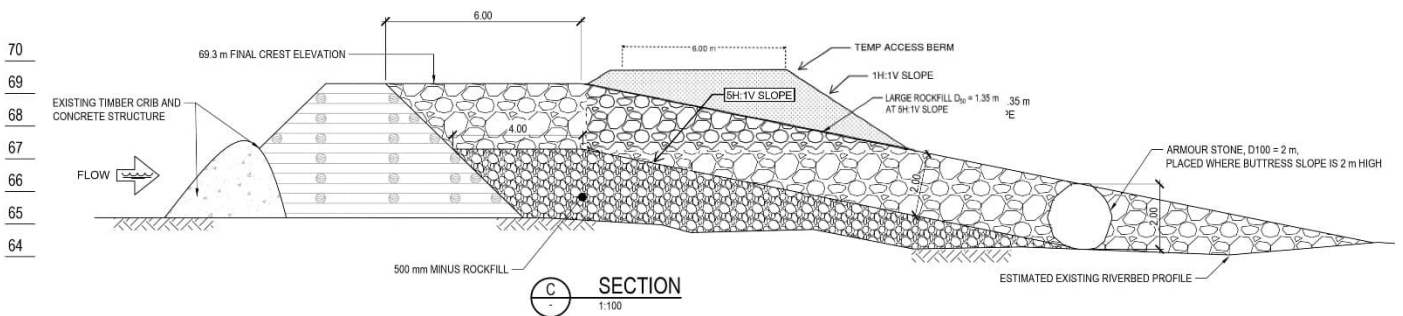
Temporary Access Berm on Cross Section through North End of Spillway
